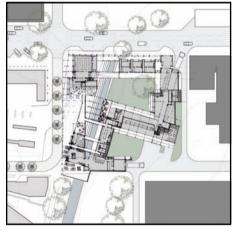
Ground floor plan, June 2013 *(Source: Author)
